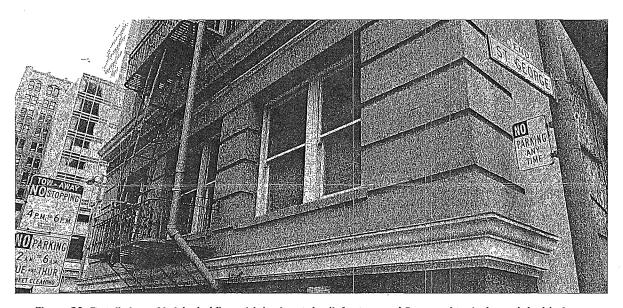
Detail view of brick cladding with horizontal reliefs at second floor, and typical wood double-hung windows. Note materials on the north façade (brick and water table bands) continue onto the west façade for a few feet (photograph taken on 01/26/2018).
